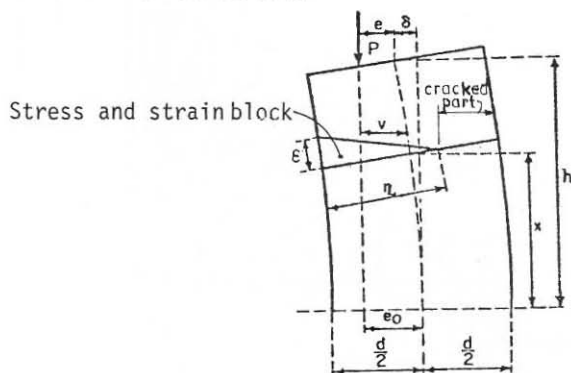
Elementary part of a masonry wall in a deflected state. Notations. [2] ANGERVO and PUTKONEN.
